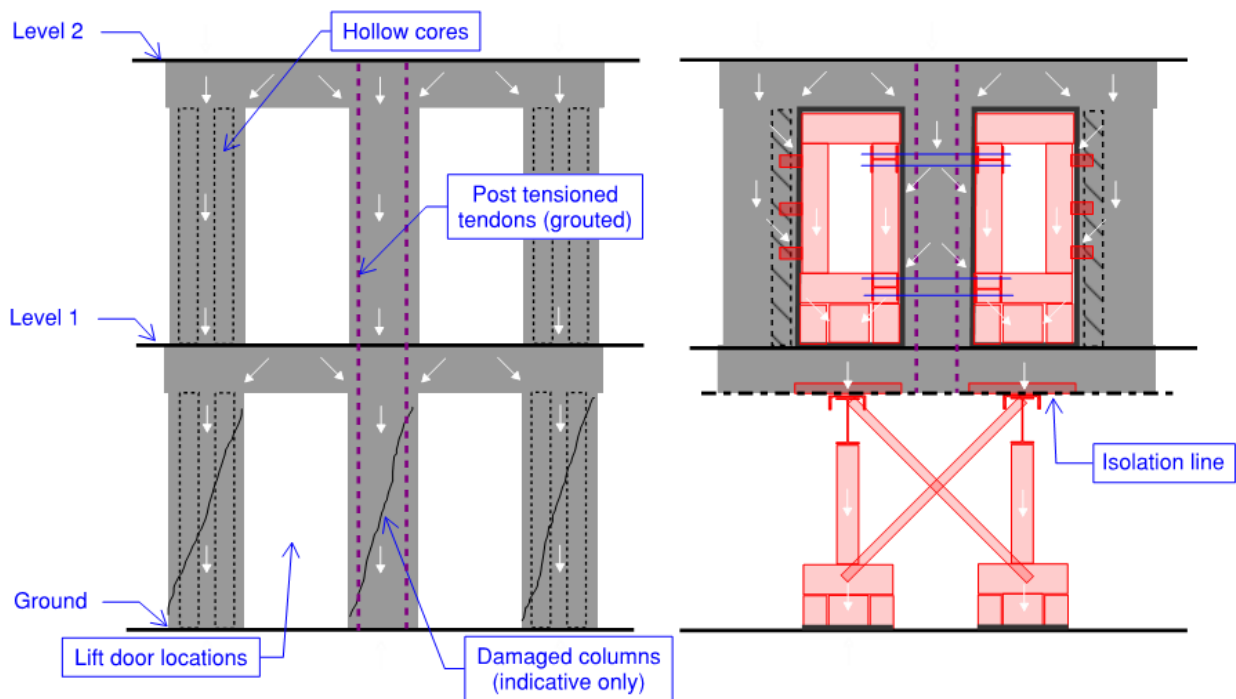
A) Structural configuration of lift shaft. B) temporary shoring. White arrows show gravity loadpath.
